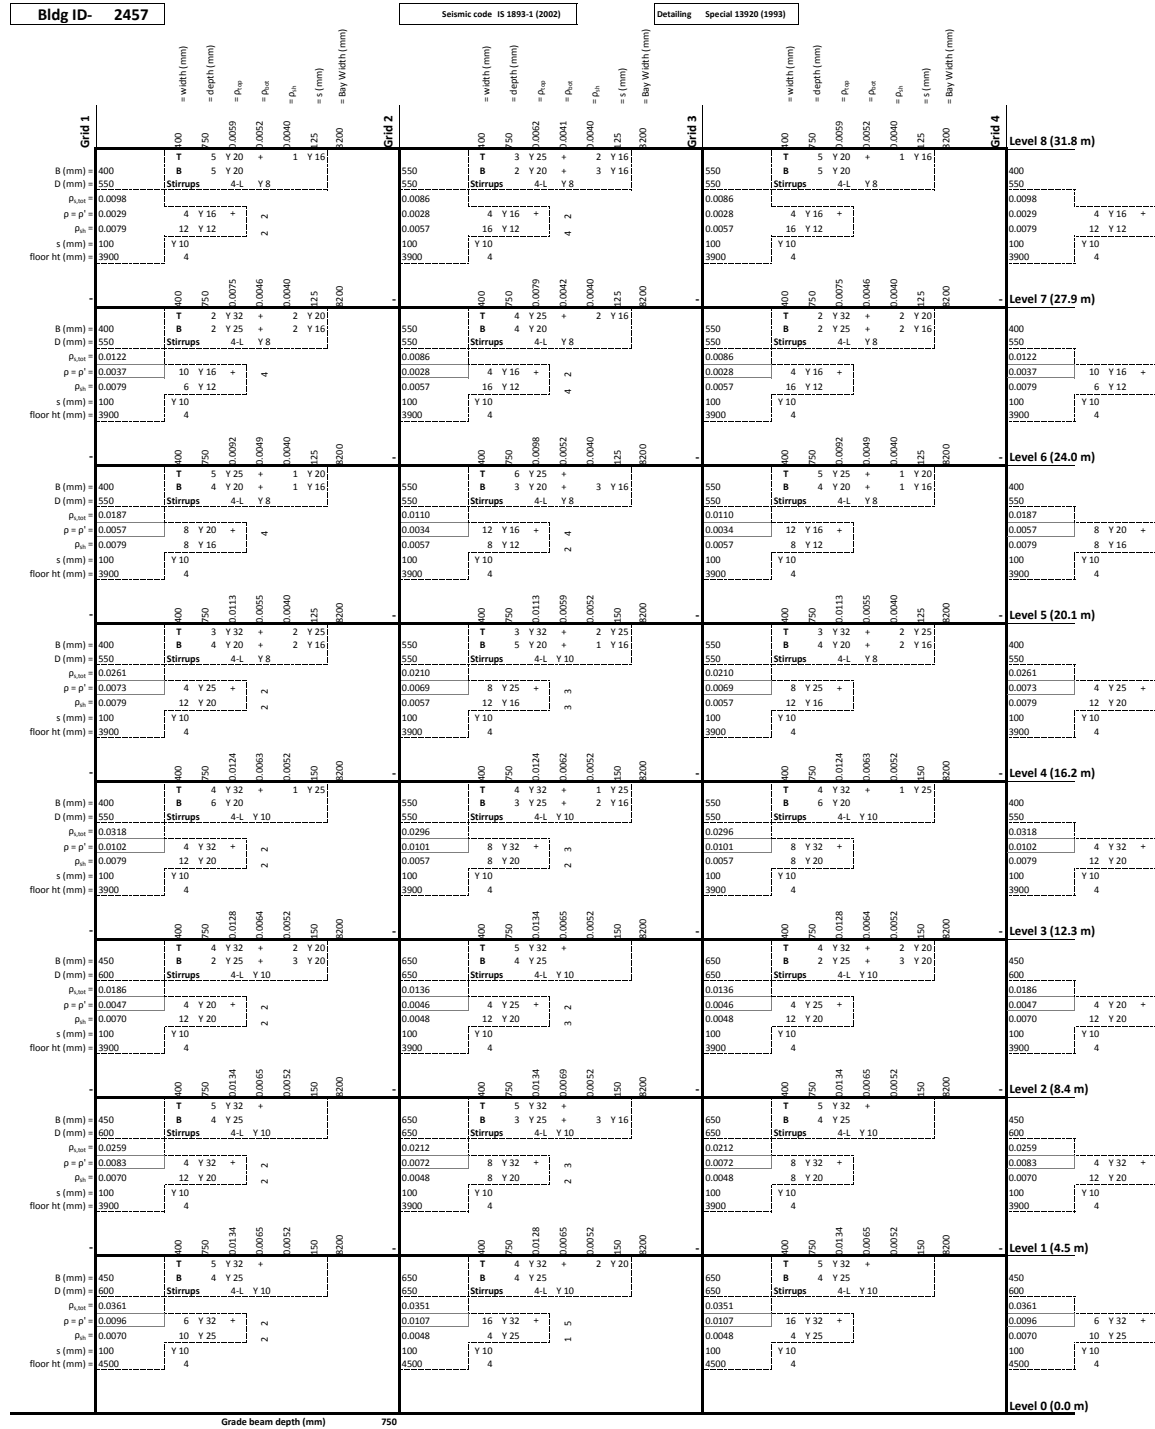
Provided reinforcement and modeling details for building ID 2457
